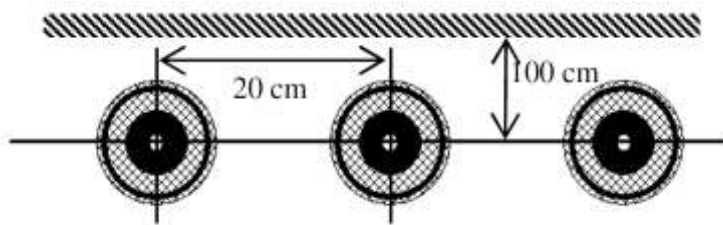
Layout of 275kV POF cable in the UK [28].
